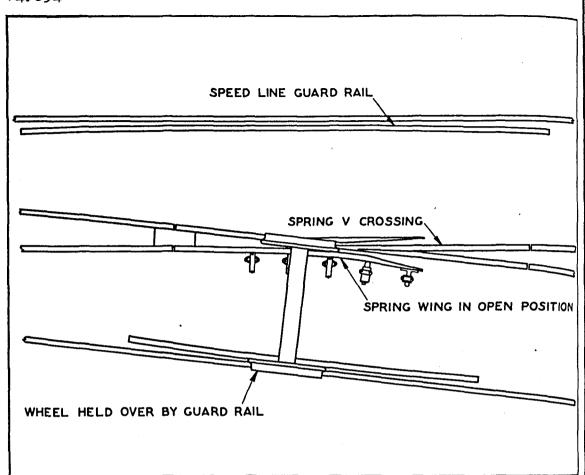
SPRING V CROSSING. SPRING WING IN OPEN POSITION.
